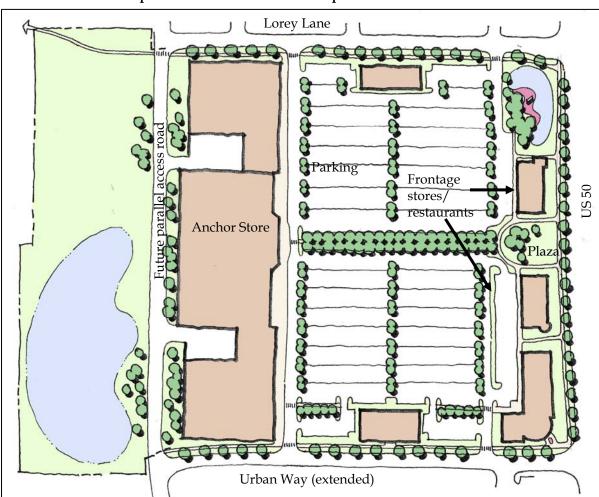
Site 2 - Proposed Destination Retail Concept
